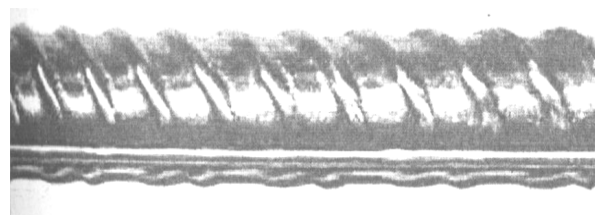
Fragment of experimental reinforcement of reinforced concrete structure
